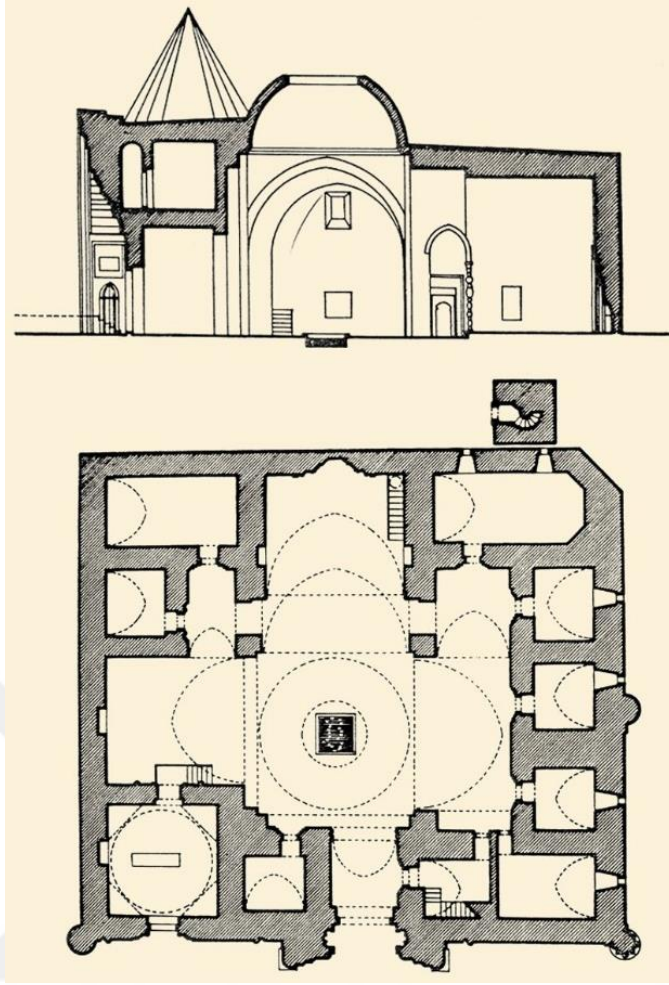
Layout and Section of Caca Bey Madrasa (A. Kuran, Anatolian Madrasahs).
